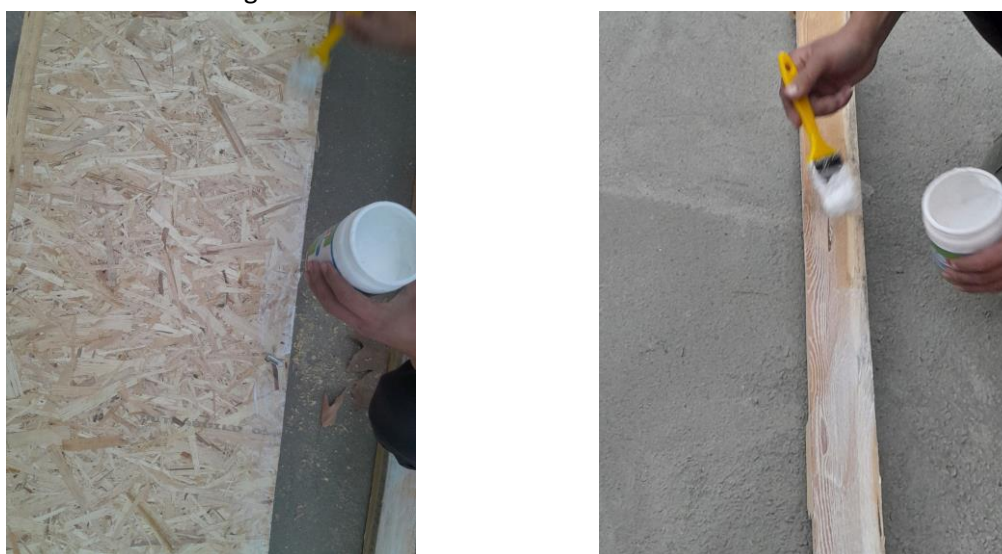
Use of PVA-801 adhesive during the fabrication of the timber beam model
